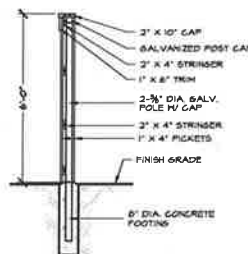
C SCREENING / BUFFER PLAN LakePointe
